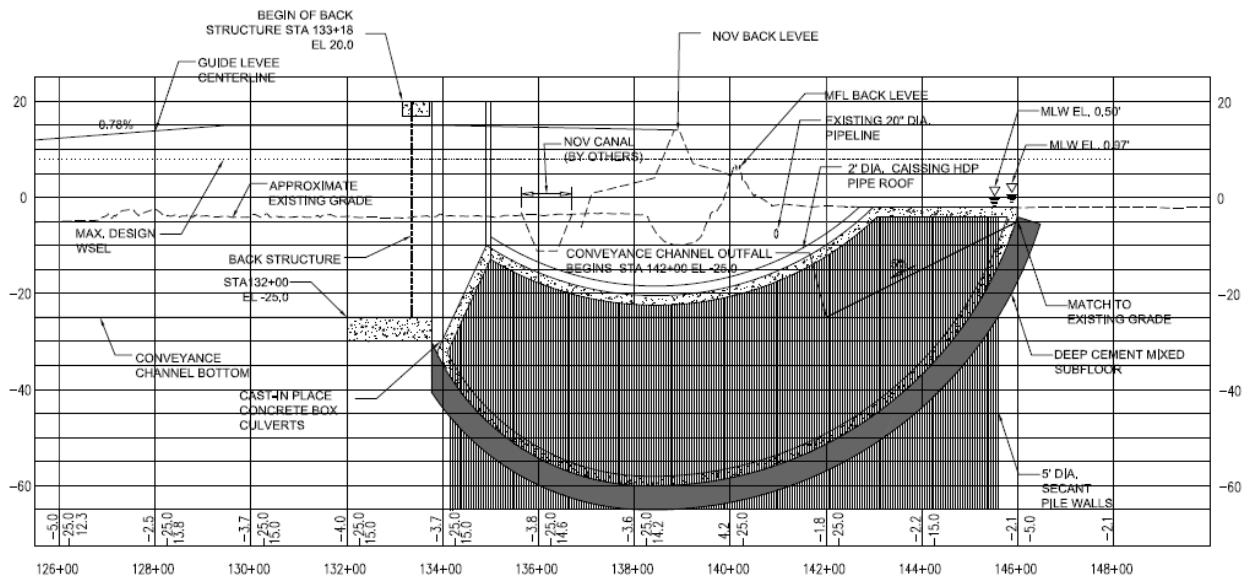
Alt. C – Profile View of the Back Structure, Submerged Box Culverts & Transition to the Barataria Basin
